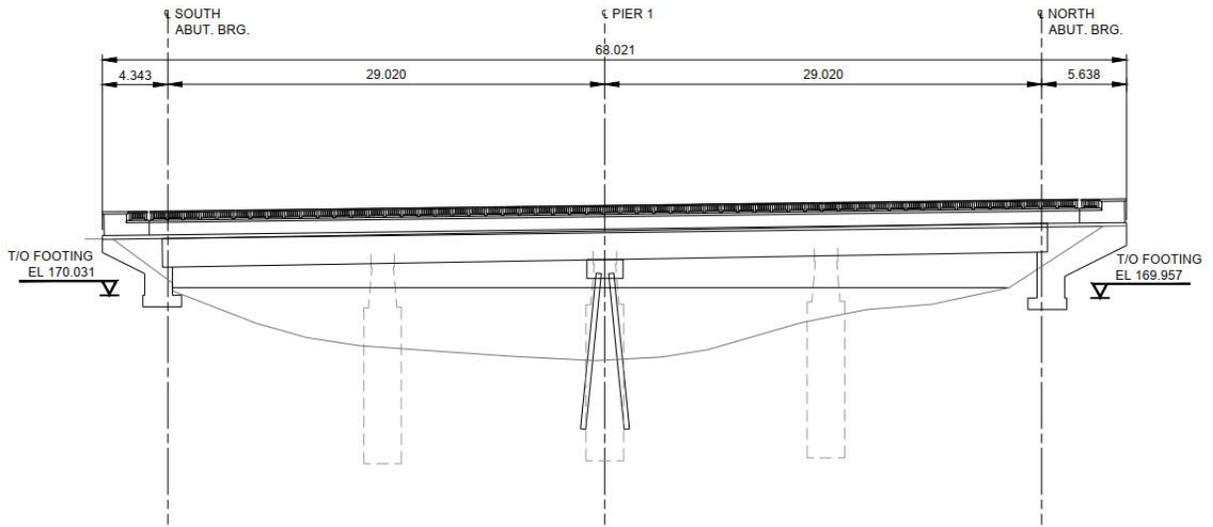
Proposed Elevation for Alternative Design Concept 2
